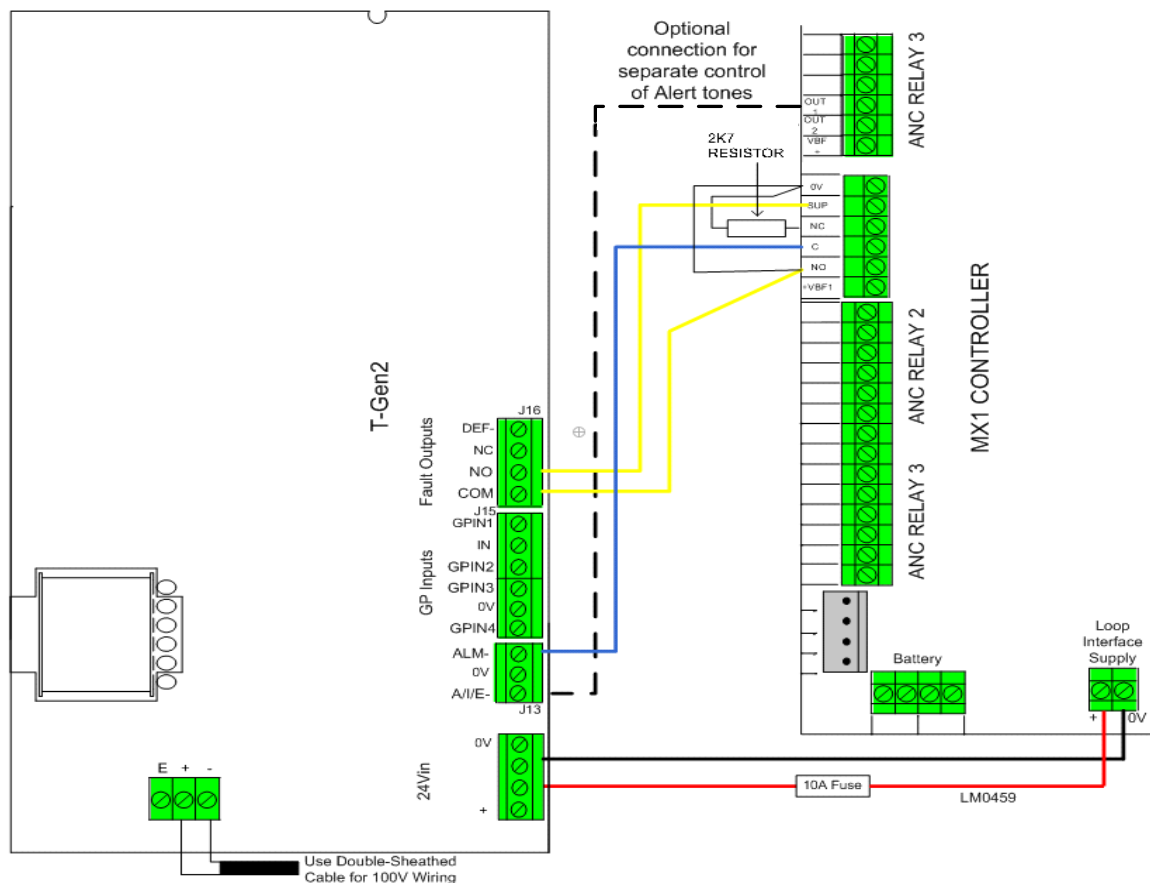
T-Gen2 Wiring Details – Grade 3
